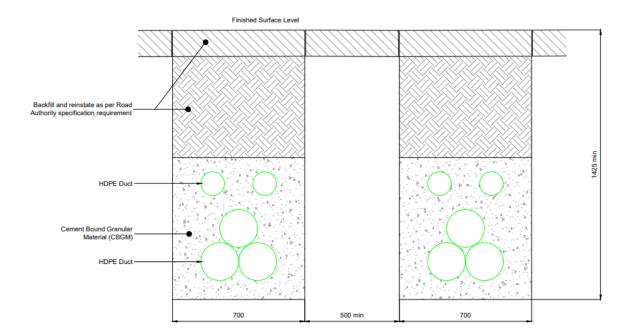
Typical cross section of a double 220 kV circuit trench in trefoil formation: extracted from planning drawing no. 229100714-MMD-00-XX-DR-C-0051
